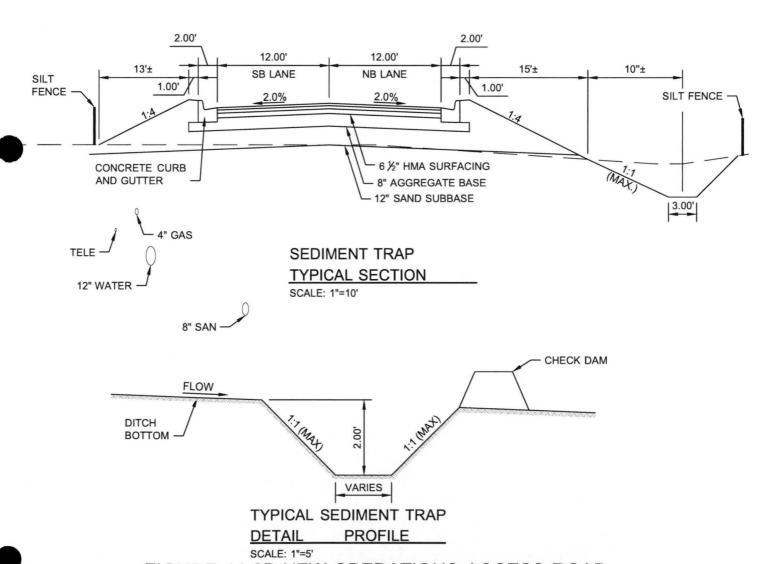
B NEW OPERATIONS ACCESS ROAD
